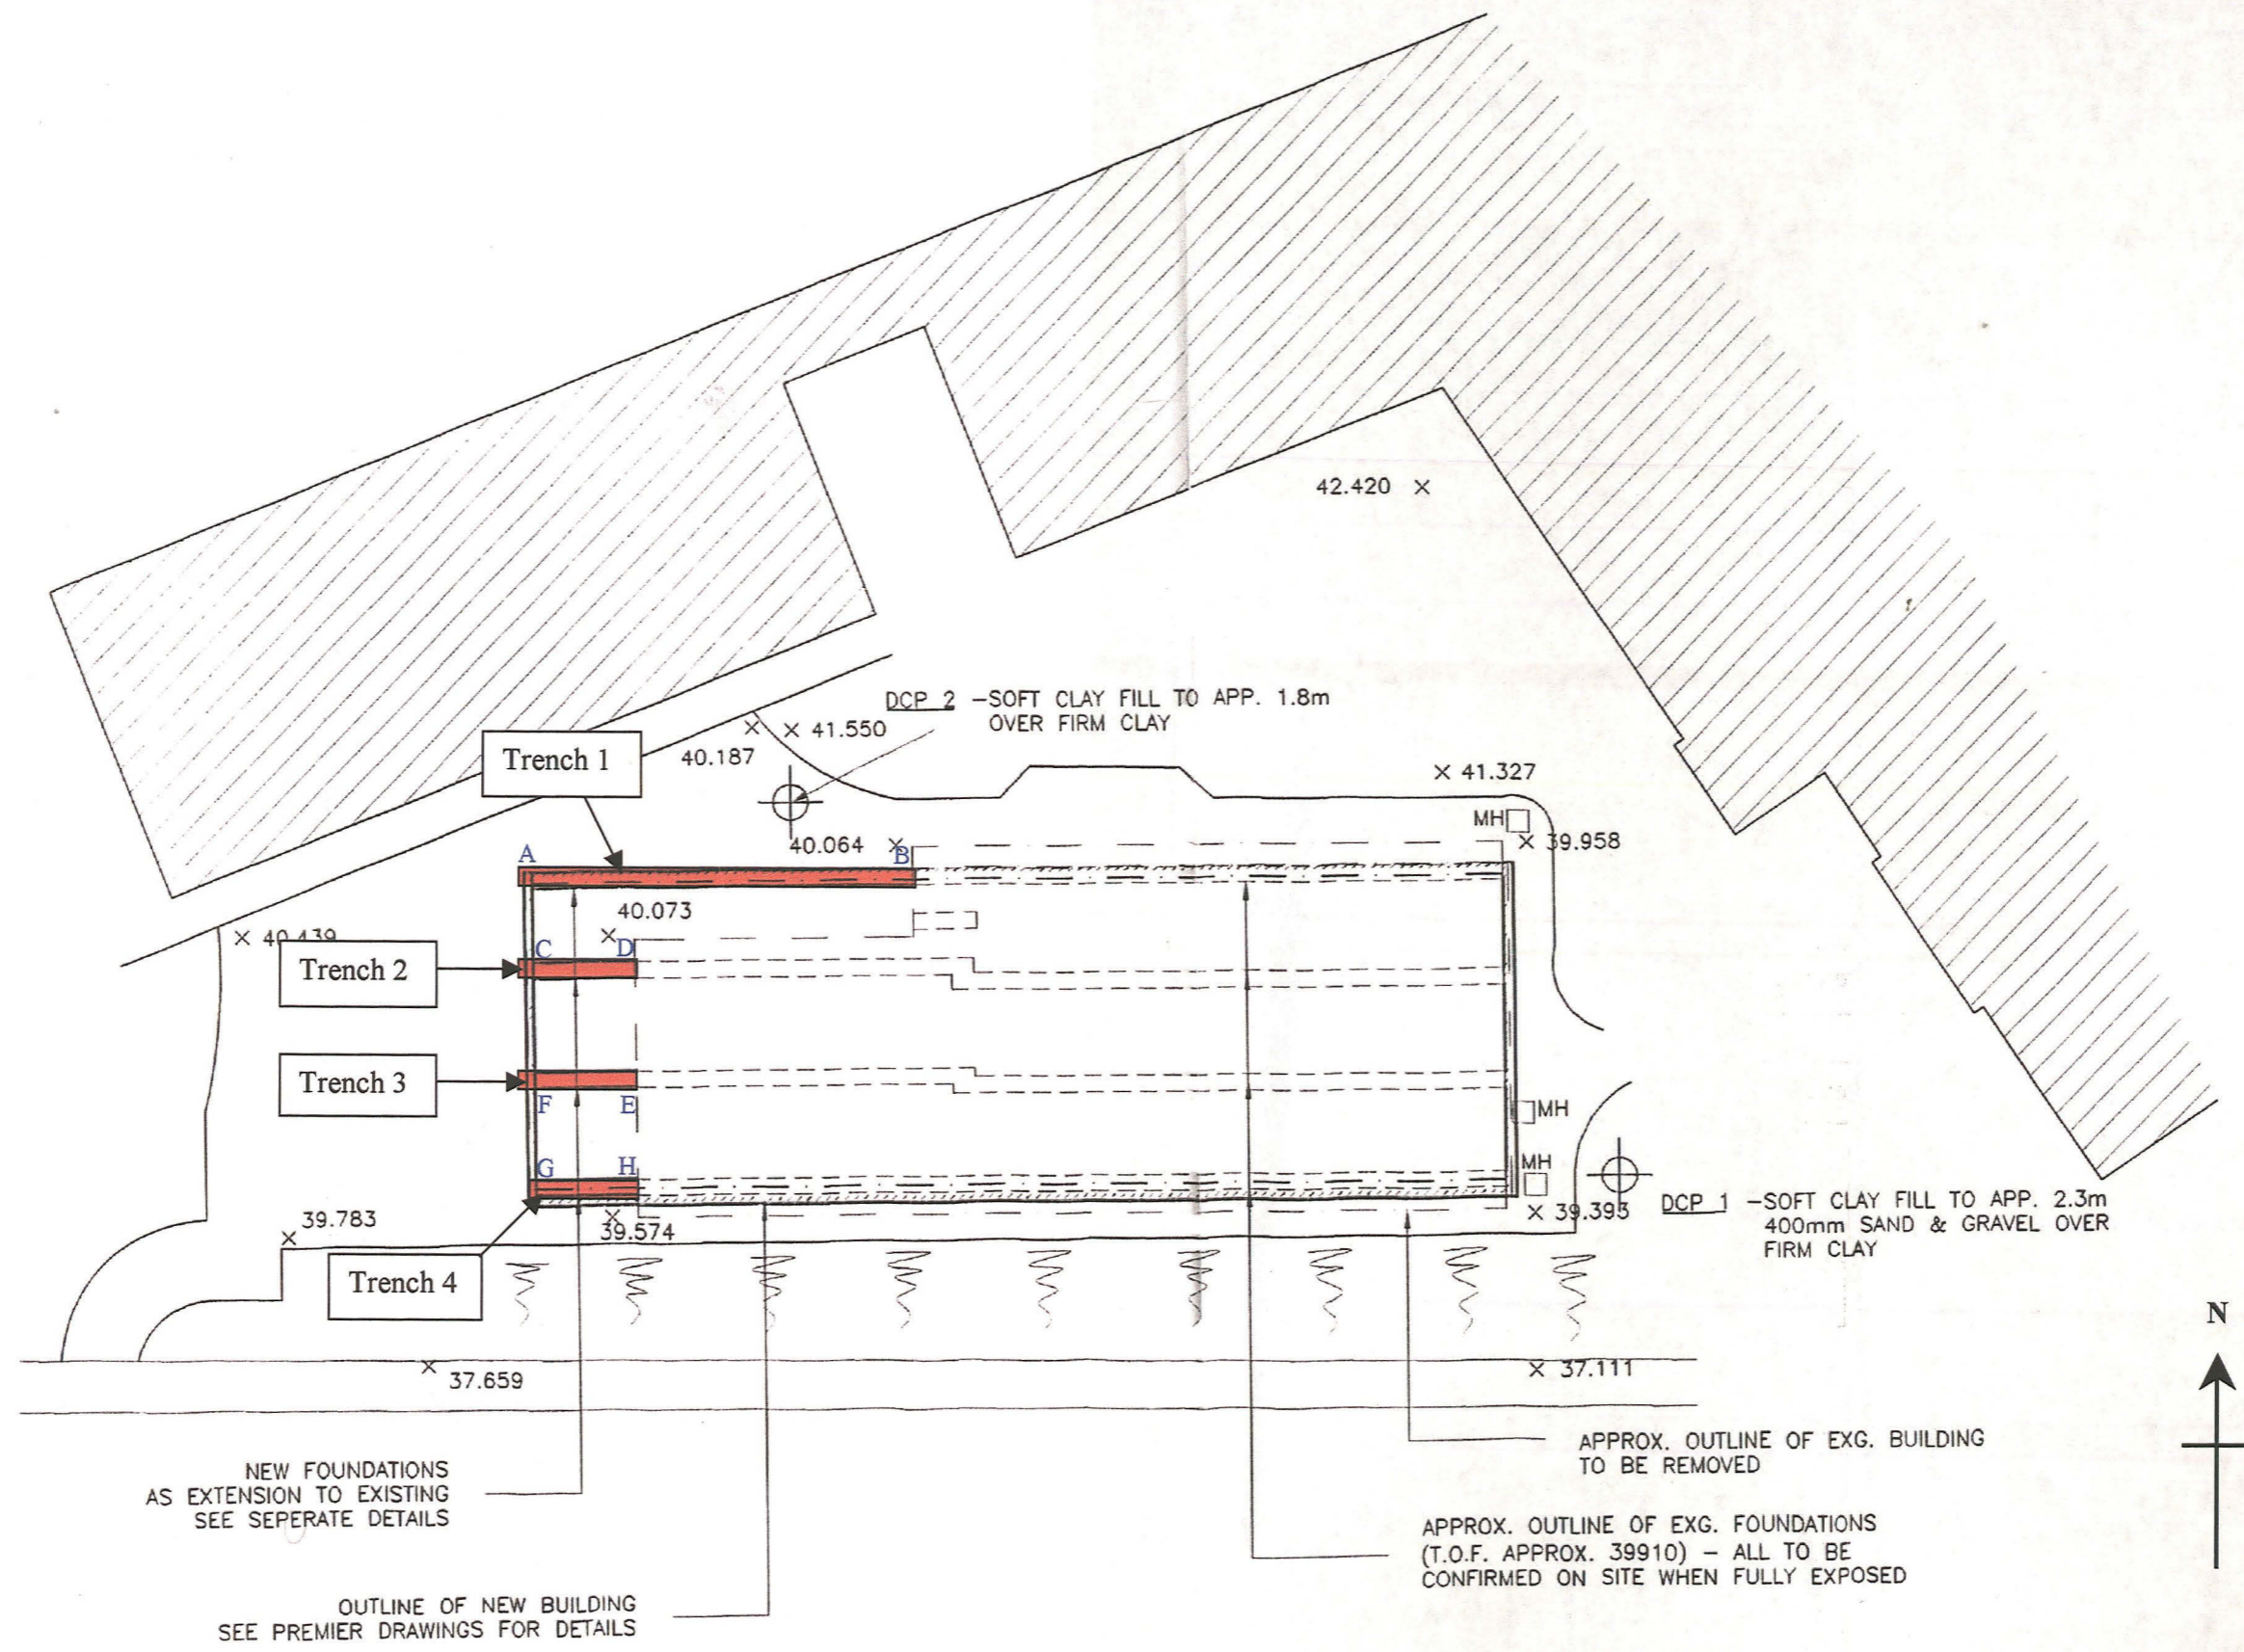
extract from architect's plan, showing location of trenches in red. Scale 1:200.
